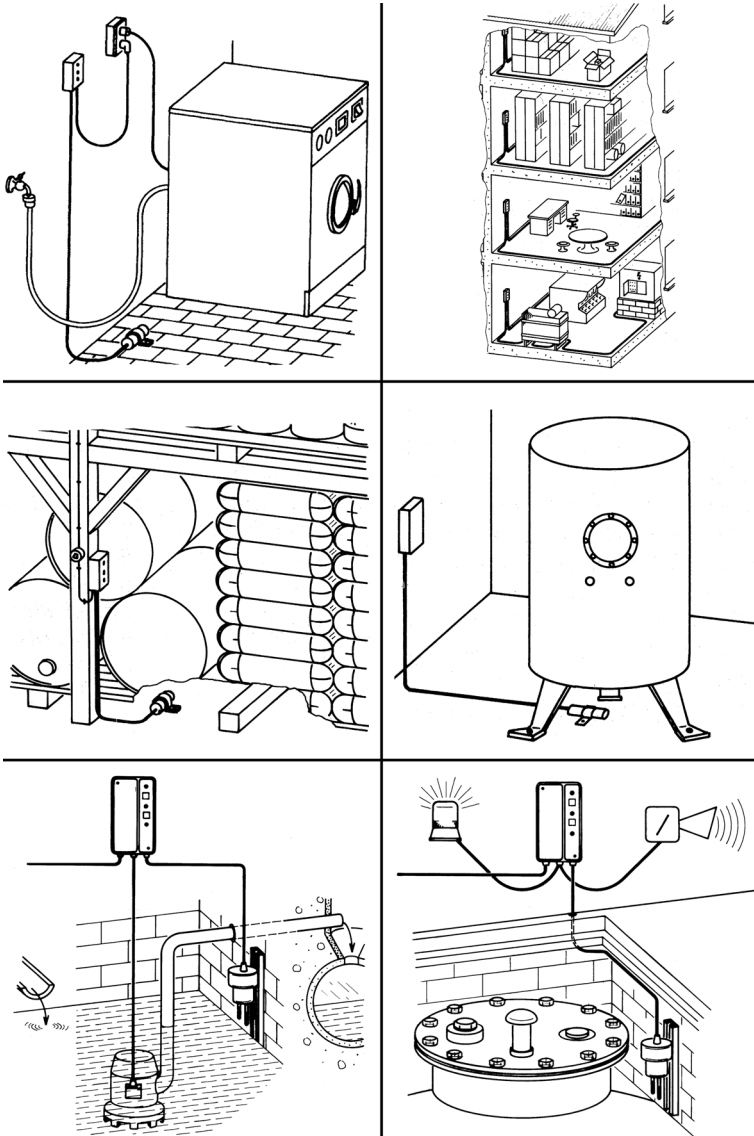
Examples in laundry rooms, kitchens, basements, office buildings, IT rooms, storehouses, industrial facilities, water treatment, boiler rooms
